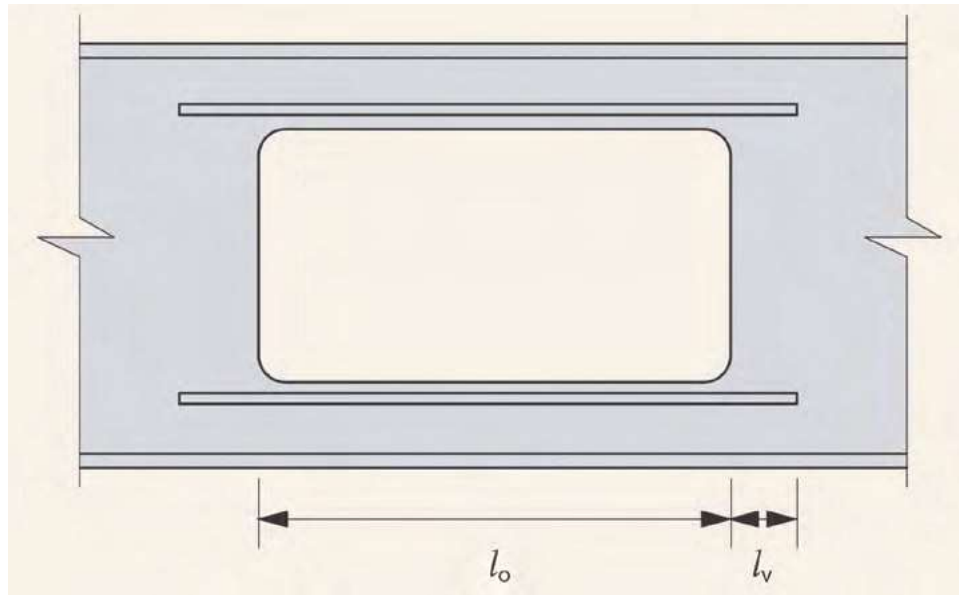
Anchorage length, l_v of horizontal stiffeners beyond each end of the opening
